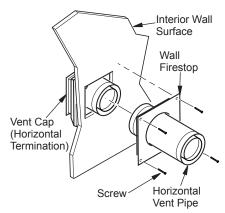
Connecting Vent Cap with Horizontal Vent Pipe
